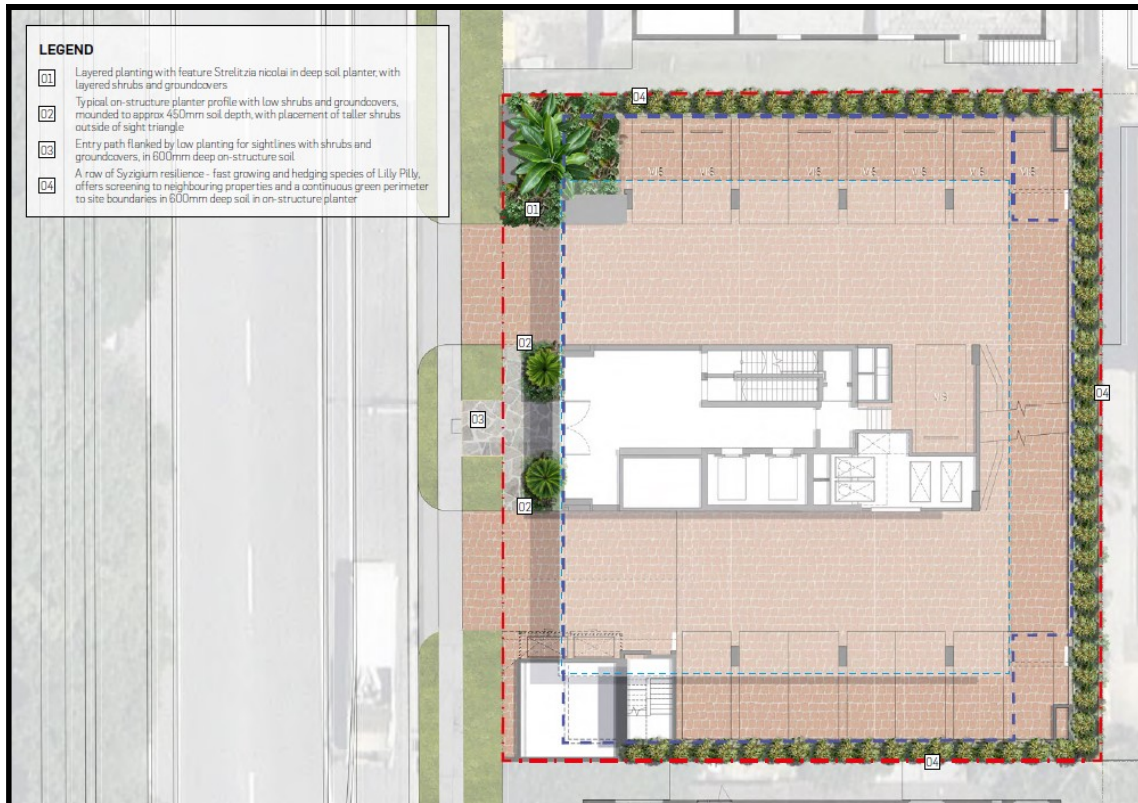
Ground Floor Landscape Concept Plan (Source – Rothelowman)
